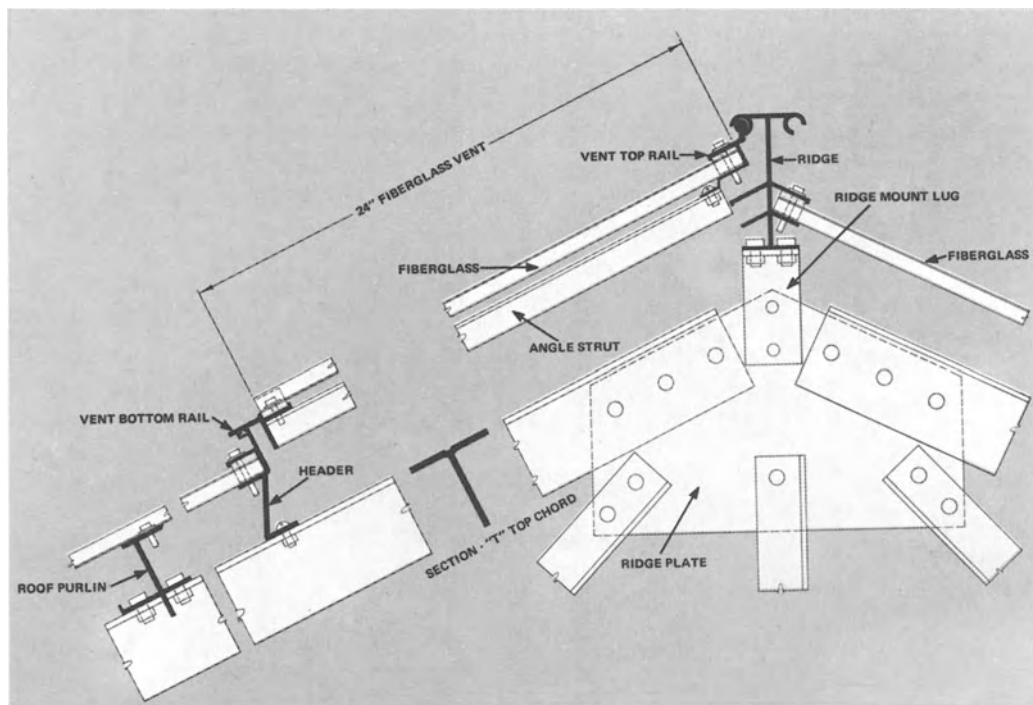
Structural details of fiberglass panel installation on a ridge with ventilator. (Courtesy National Greenhouses)
